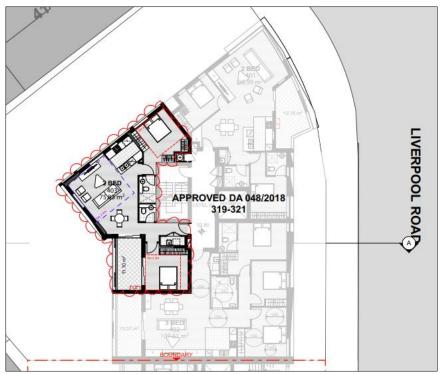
Level 2 floor plan. Source: Ghazi Al Architect (2024).
